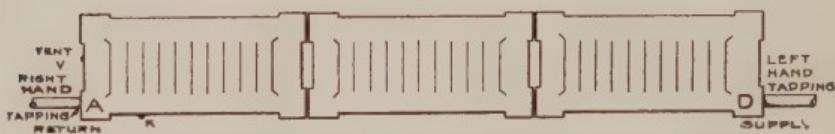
Assembled Three Horizontal Sections in Single Tier One and Two-pipe Steam
